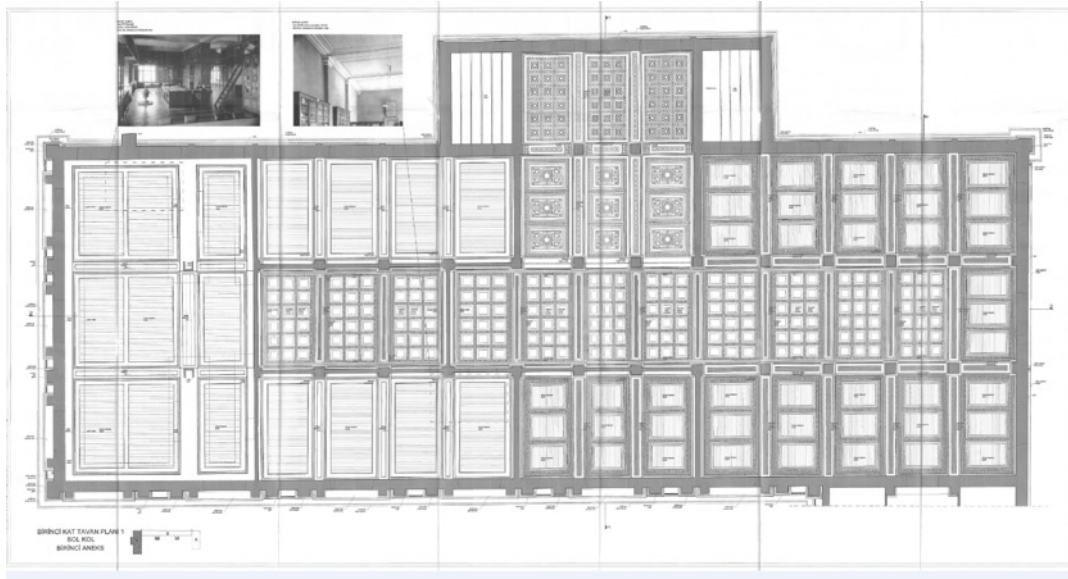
The Restitution plan of first floor ceiling of 2<sup>nd</sup> phase (source: *Seçkin Mimari Hizmetleri*, IDSM Archive)
